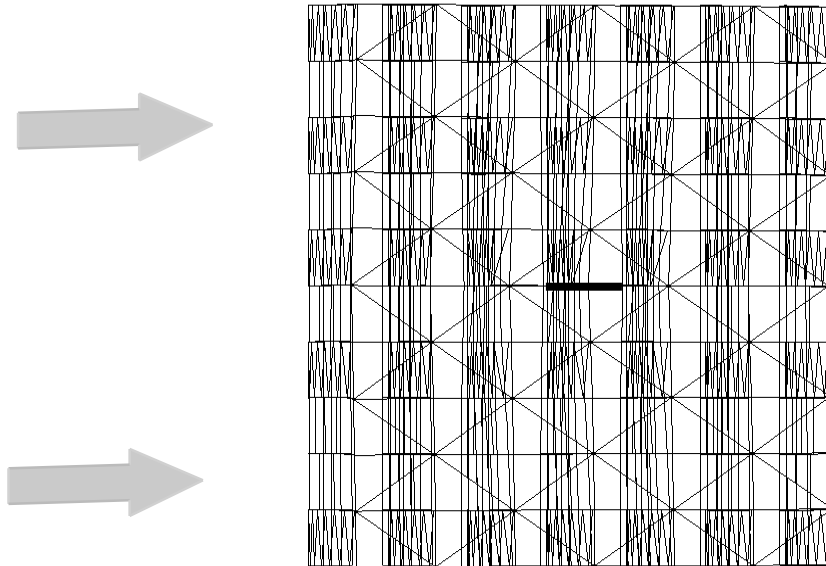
Plan view of symmetrical sway mode in a double-entry Drive-In Rack
